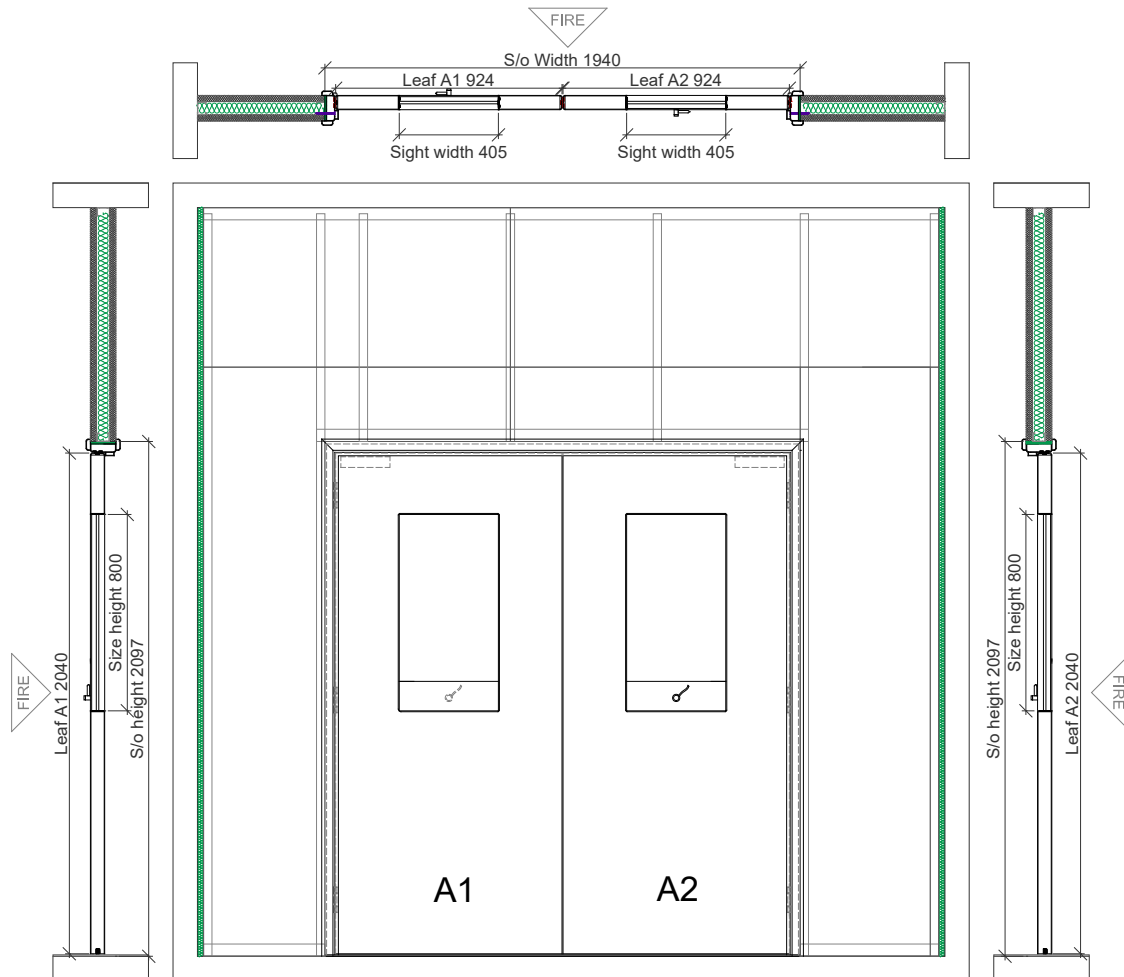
General arrangement of test construction viewed from the unexposed surface
